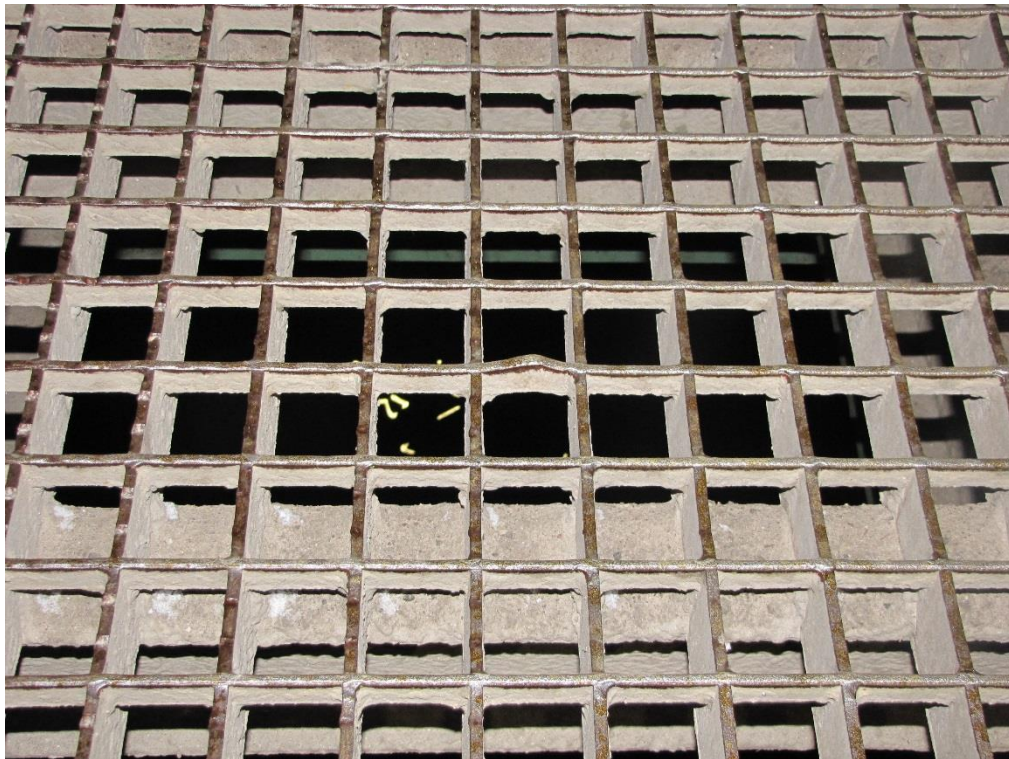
Bent Transverse Cross-Bar (Typical throughout)
